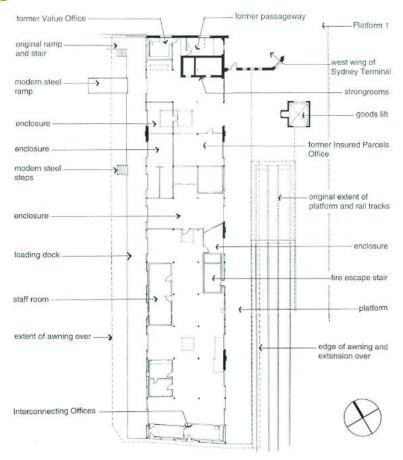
Existing Floor Plan of Inwards Parcel Shed, Sydney Terminal¹
